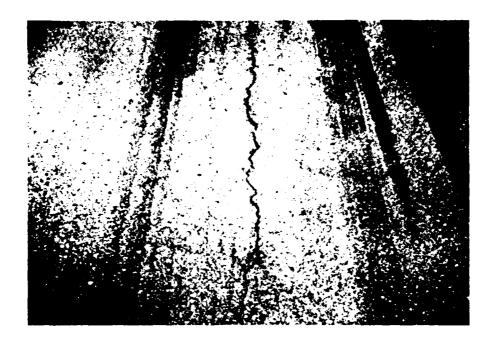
Low severity joint reflection cracking, nonfilled crack
